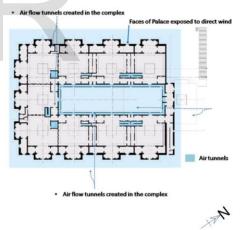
Madhavendra Bhavan- Ground floor plan (Plan of Madhavendra Bhavan depicting the air movement, on facades and air tunnels effect created in narrow passages and staircases)
